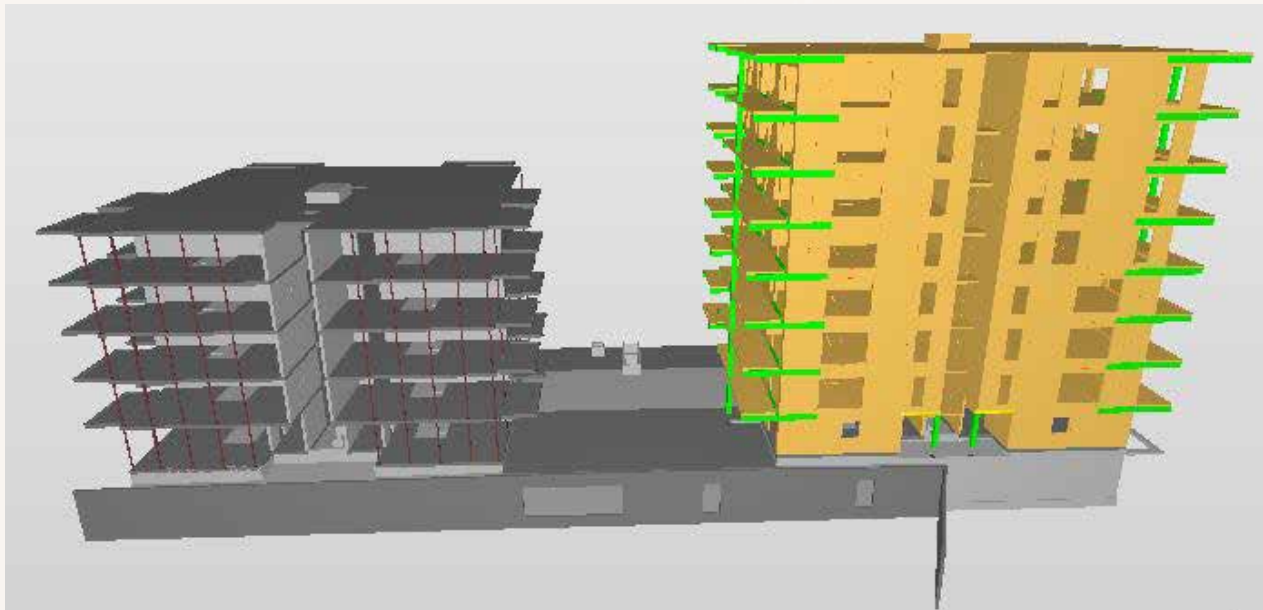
M2 (left) and MTRE (right) with the concrete underground parking underneath. The picture is taken from the Solibri model of the buildings.
